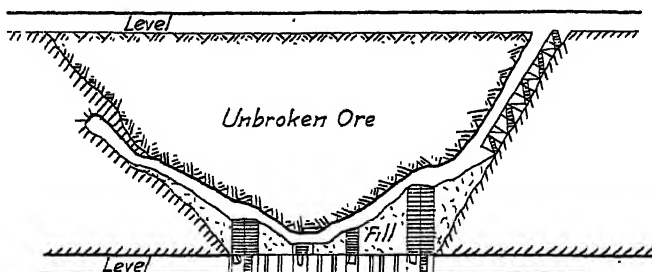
CUT-AND-FILL STOPE, RILLED FROM A STOPING RAISE AT ONE END AND FROM A WASTE RAISE IN BARREN VEIN IN OTHER END; STOPE CHUTES AND MANWAYS CRIBBED; ORIGINAL STOPING RAISE STULLED.
